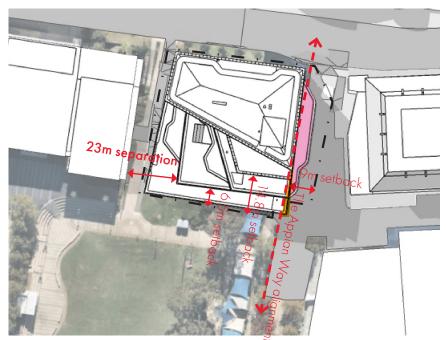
Building Setback - Plan Diagram (Source: Tract 2019)
